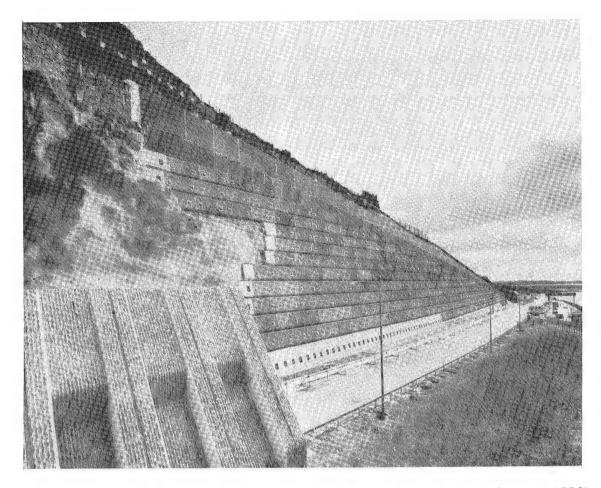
Precast concrete panel retaining wall at Pen-y-Clip Tunnel (from Concrete 1993)
